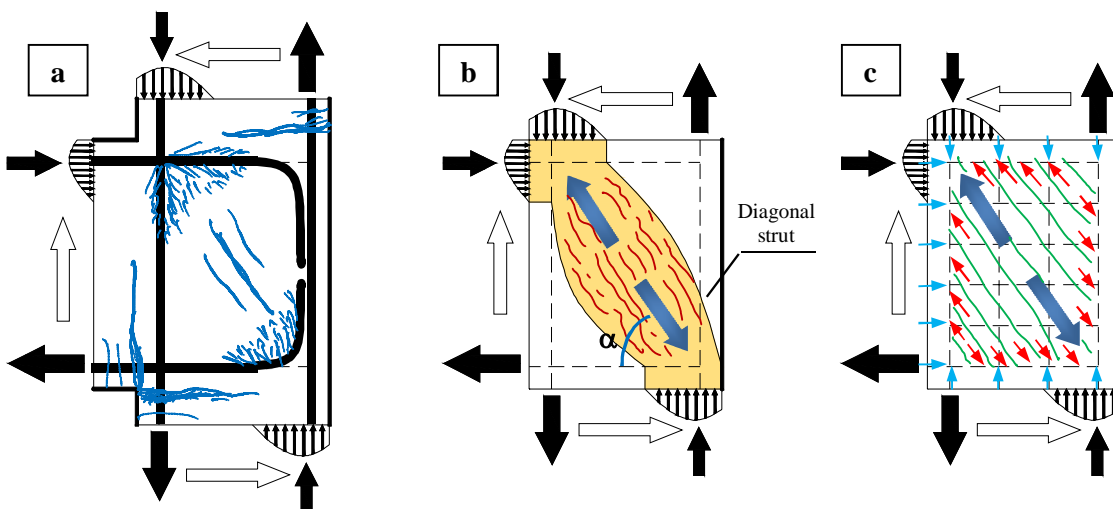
a) Lateral forces, b) strut mechanism and c) truss mechanism
